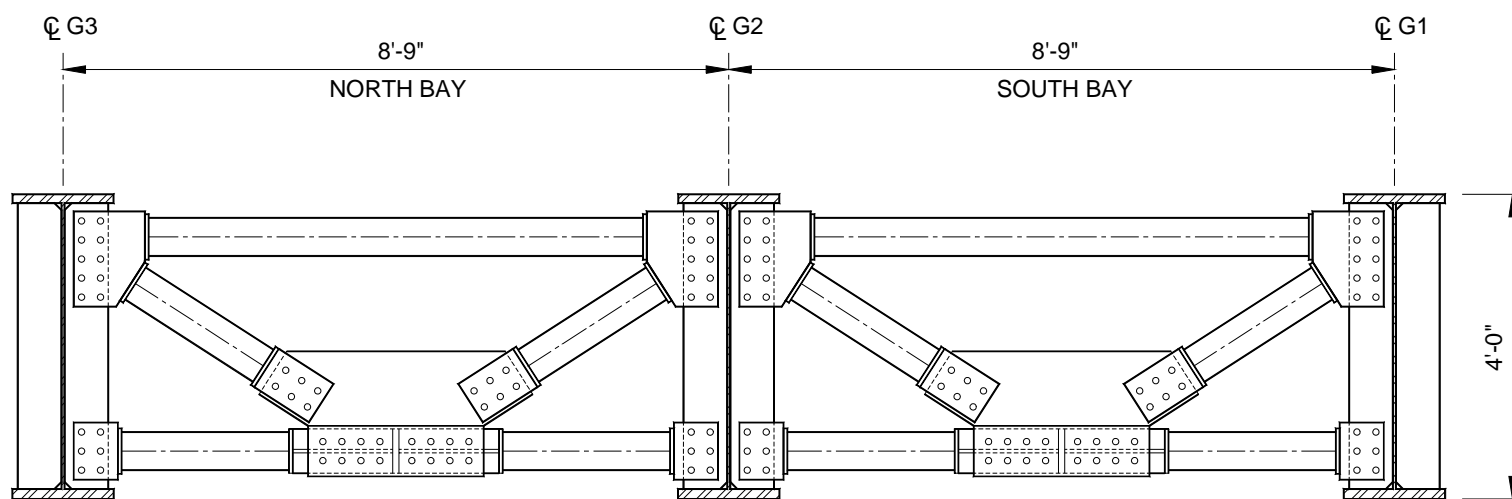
Cross-Section of Test Frame at a Cross Frame Location 6L
